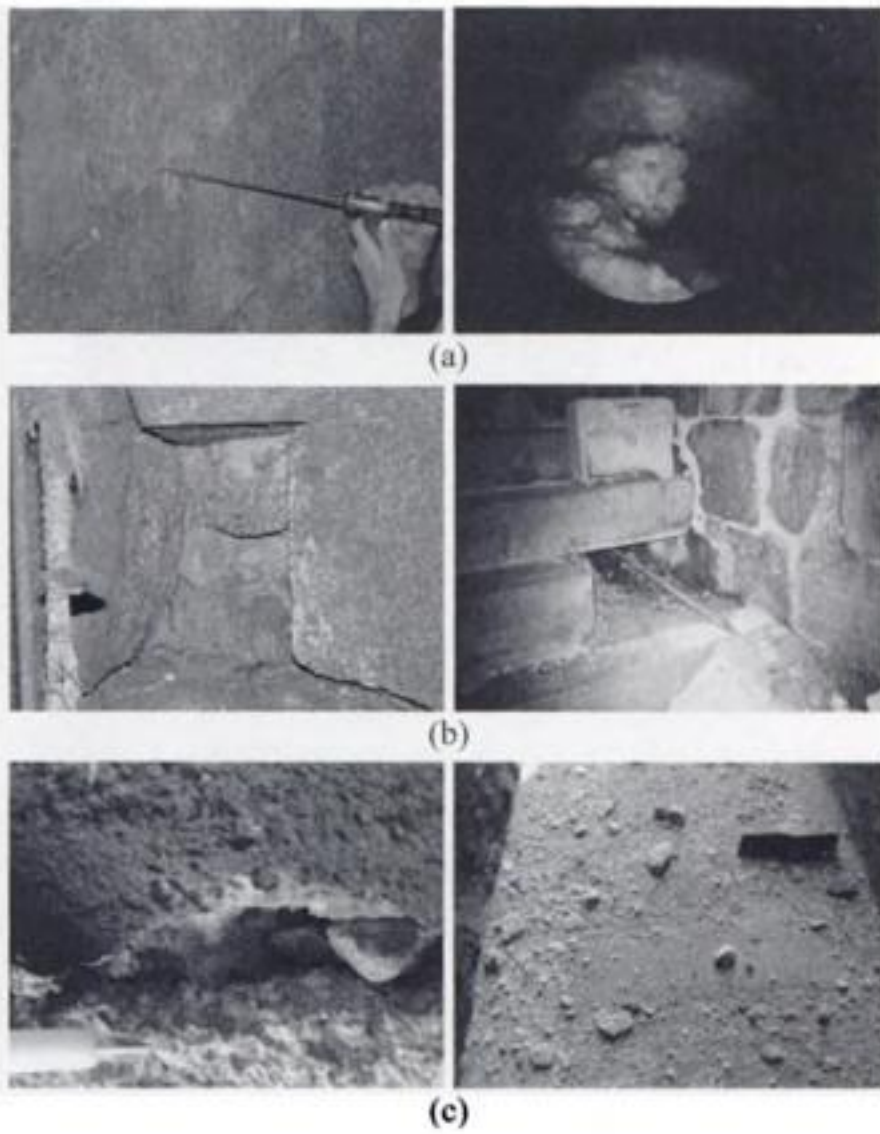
Visual inspection to define the constitution of masonry walls: (a) boroscopic camera, (b) opening up the structure (c) loss of material through central cracks in the openings.
